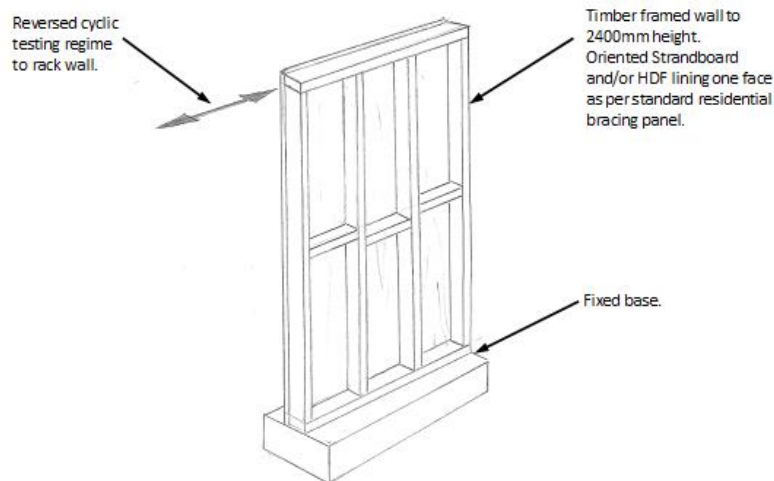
SCHEMATIC DIAGRAM OF MANUFACTURED SHEET WALL BRACING
